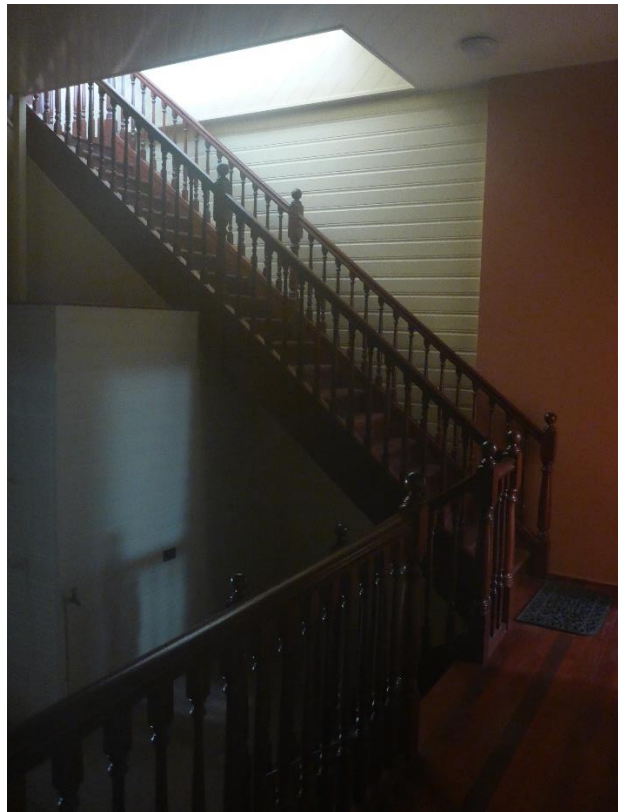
The modern staircase connecting the internalized ground level courtyard to the level above has been finished with traditional-style replica timber balustrading as an apparent faux heritage feature. (Source: VAULT)
